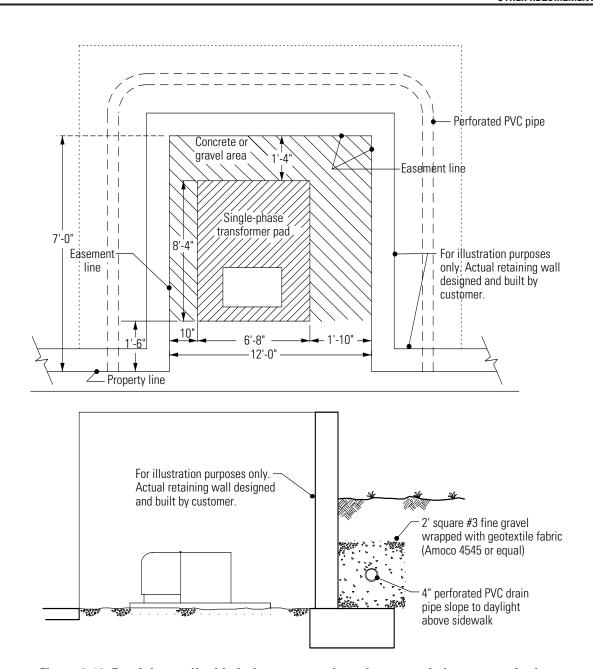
Retaining wall with drainage protection when weep holes are required.
